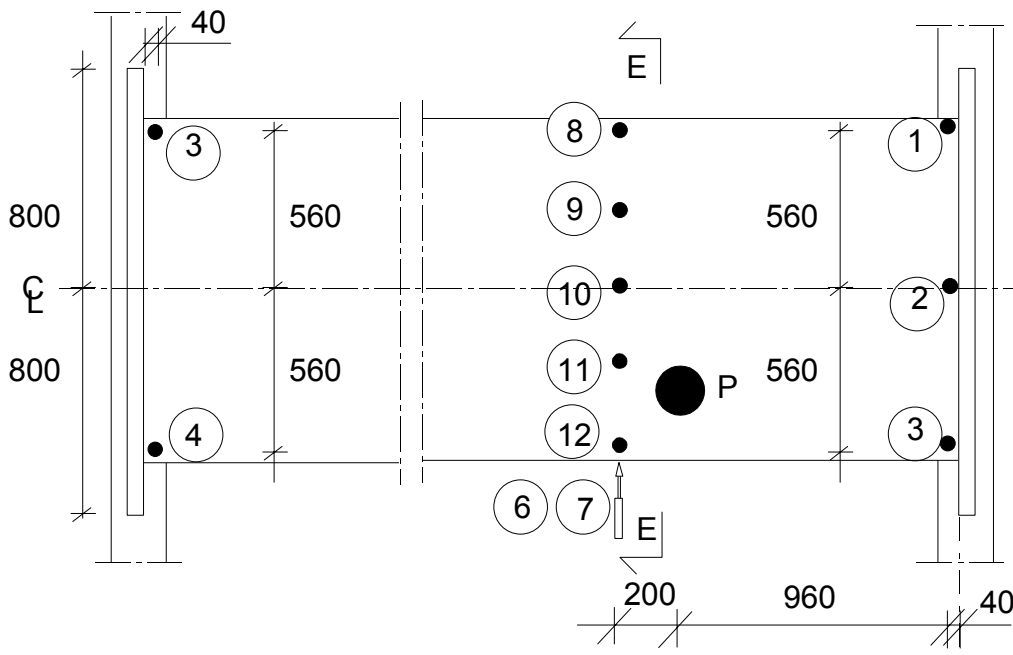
ST400E1M, plan. Numbering and location of transducers. For section E-E see Fig. 18.
